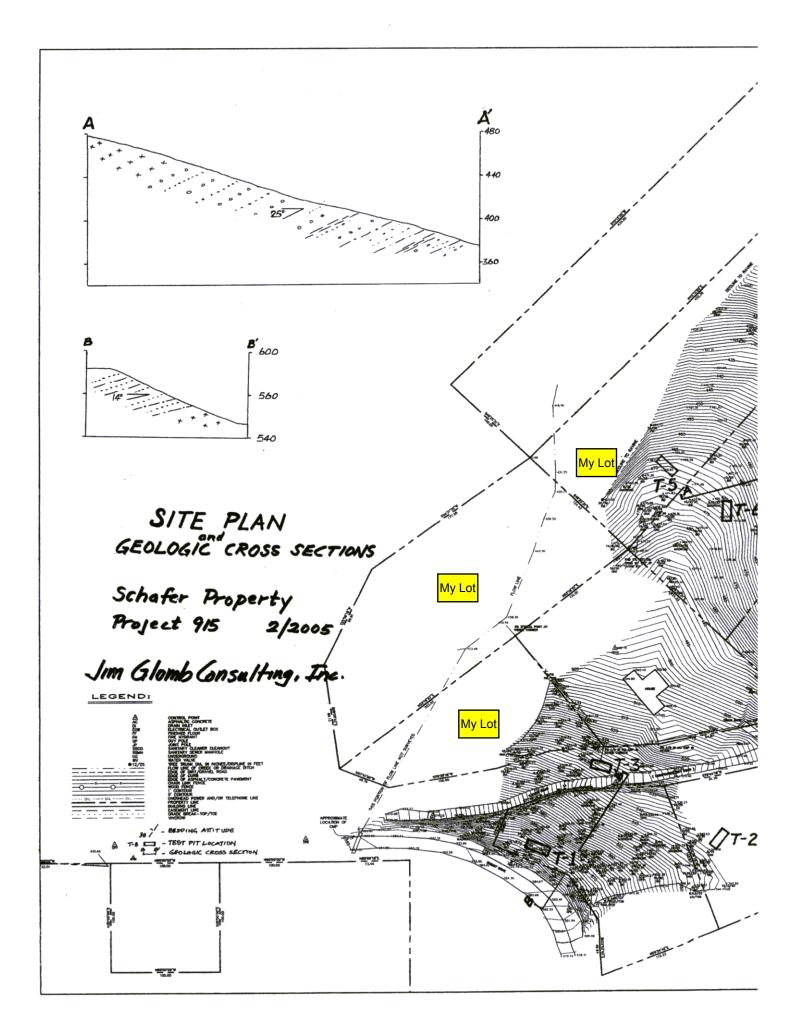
Site Plan and Geologic Cross Section Plate 2.1 through 2.8 - Logs of Test Pits
